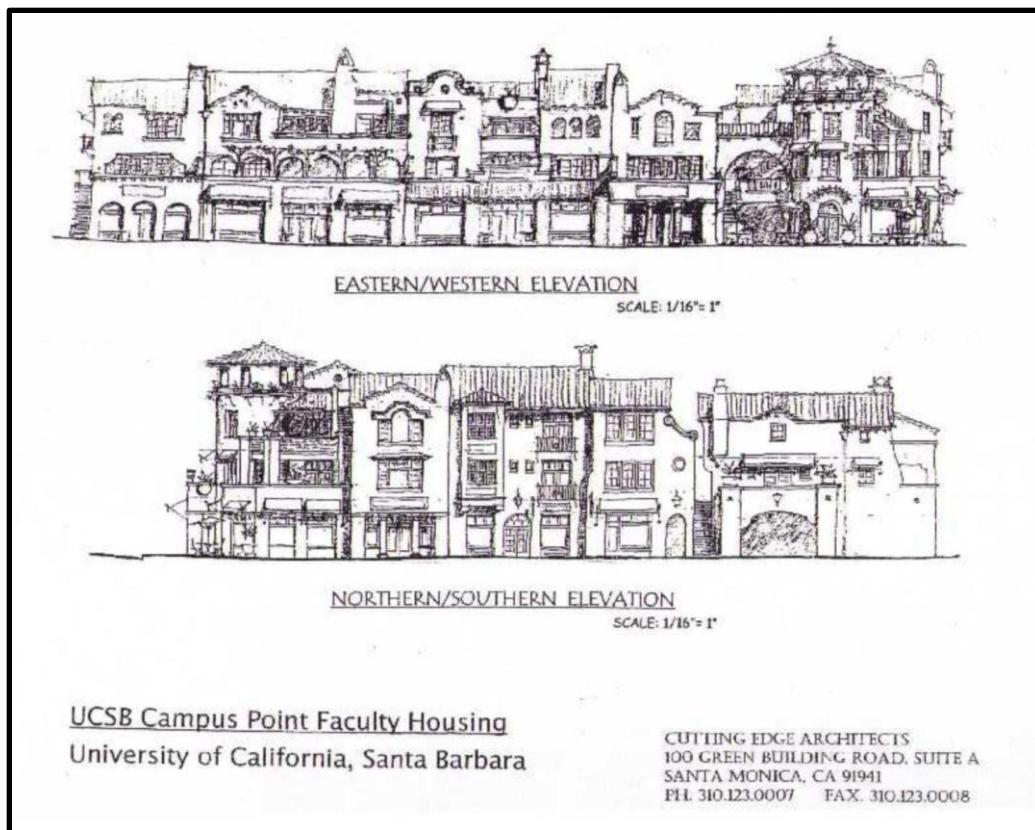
Architectural Elevation for UCSB Campus Point Faculty Housing
